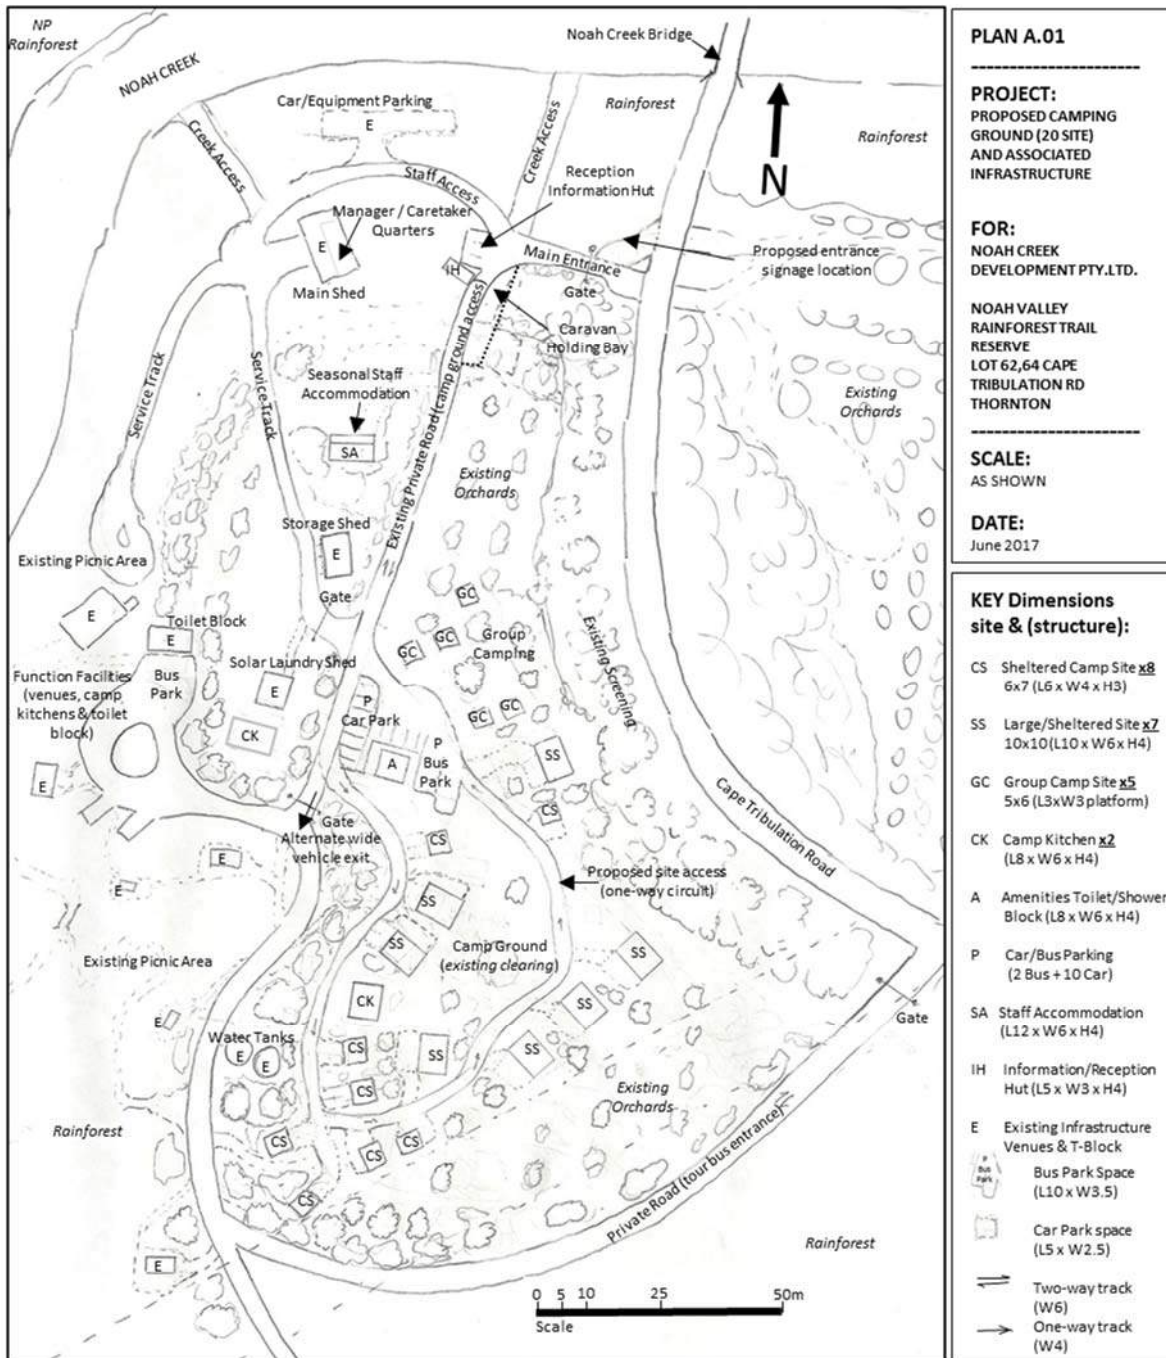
Layout plan No1. Showing the proposed Camp Ground Sites and Infrastructure
